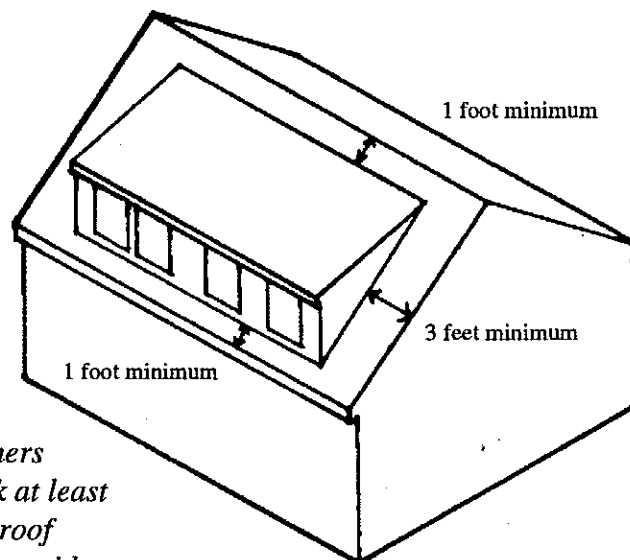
Dormers should be set back at least one foot from the roof edge, three feet from either gable end.
